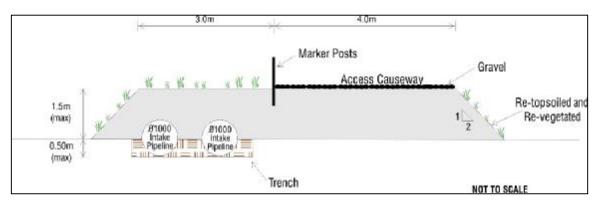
Intake Pump Station Access Causeway Cross-section
